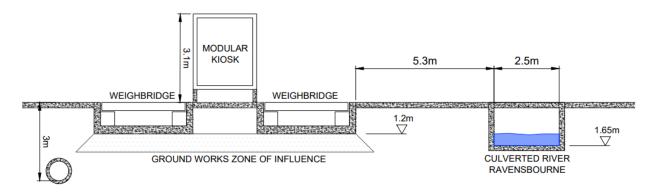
section through kiosk and weighbridges (shows foul sewer on left, and culverted river on right)
